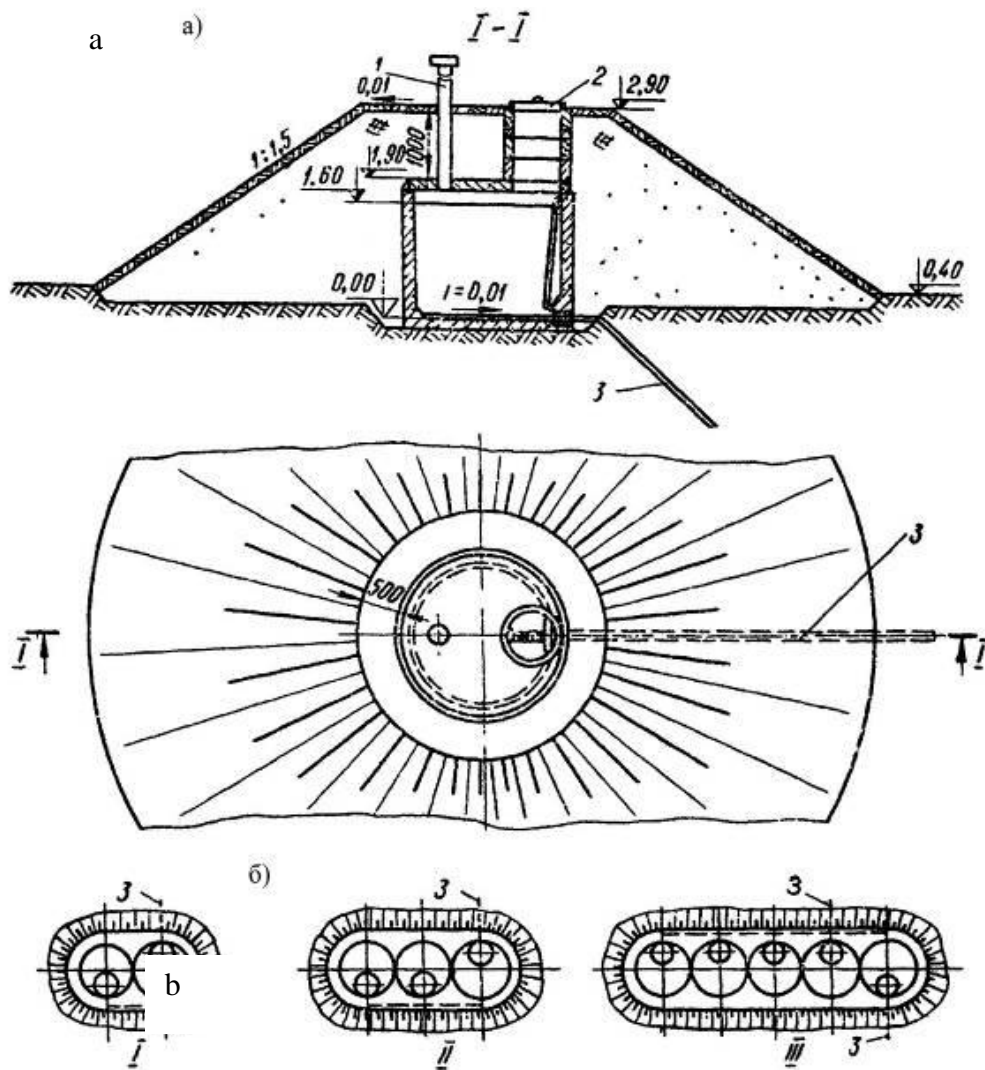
Collection tanks with a capacity of 5 – 25 m<sup>3</sup> (standard design No. 901-4-19): a – design solution; b – diagram of the set of tanks: I – 10 m<sup>3</sup>; II – 15 m<sup>3</sup>; III – 25 m<sup>3</sup>; 1 – ventilation pipe; 2 – hatch; 3 – feed and flow pipe, Ø 50 mm
